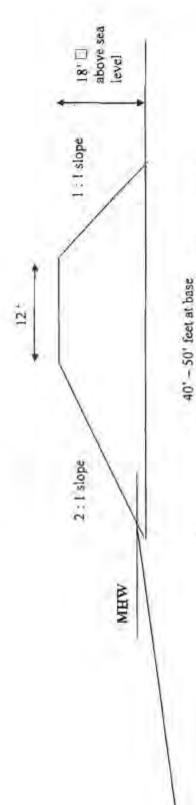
Berm Plan CDP 4-14-1806 Proposed Protective Dune Construction
